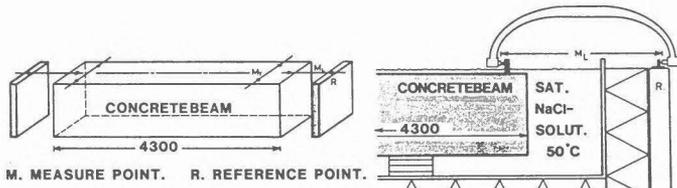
The R measuring points are placed on a steel profile, and each of them is fixed to the concrete floor with four 18 mm steel expansion bolts.
